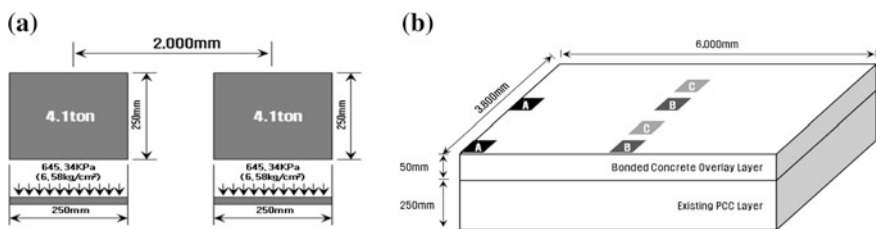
Traffic loading conditions: a vertical traffic loads, and b loading points
